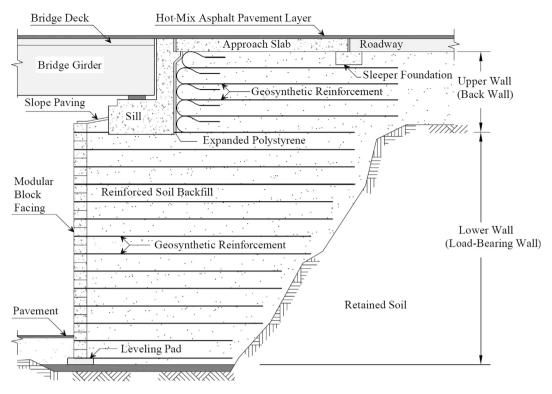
Typical GRS bridge abutment system with modular concrete block facing.
